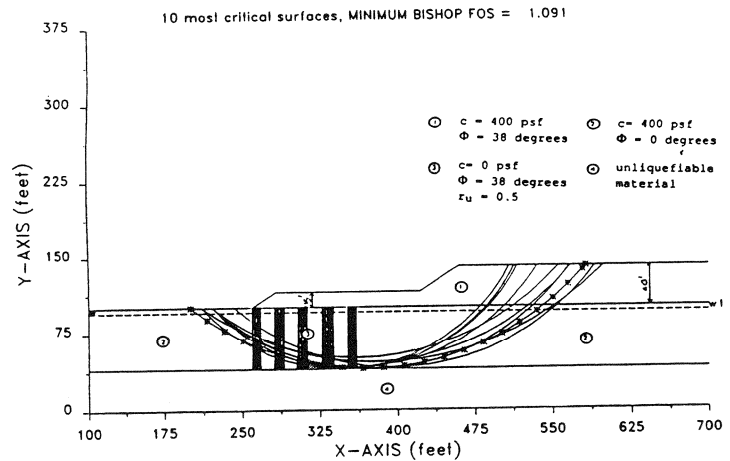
Stability of 40-ft Embankment With Berm And Stone Column Support
